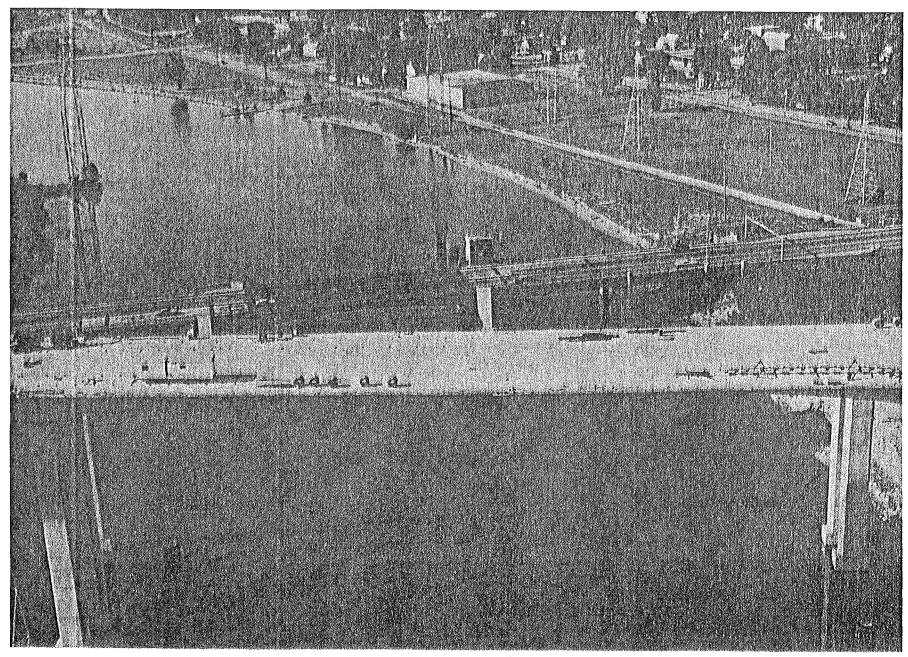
Aerial view of Span 13 (Pier 12N to 13N)
